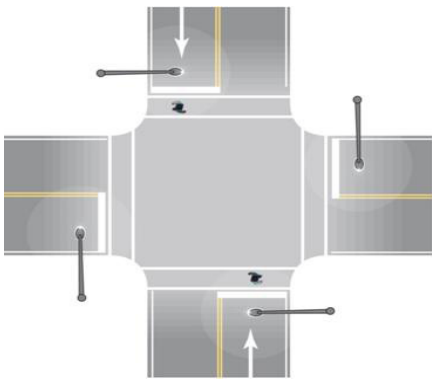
New FHWA design recommendations for lighting layout for crosswalks, Source: FHWA Report on Lighting Design for Crosswalks, April 2008.
